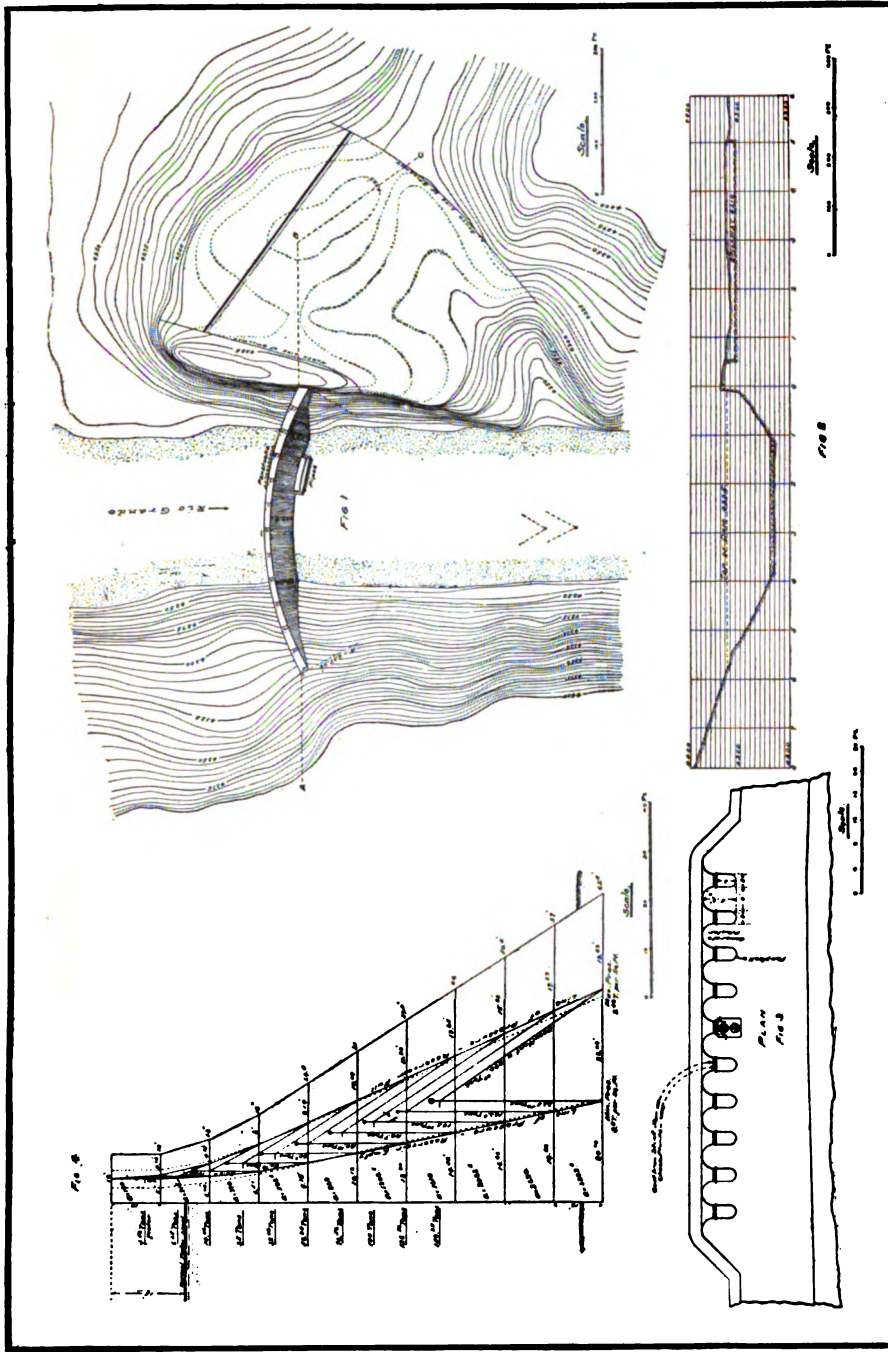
ELEPHANT BUTTE DAM ON RIO GRANDE, ABOVE EL PASO, TEXAS. PLAN AND SECTION OF DAM-SITE, PROFILE OF DAM, AND PLAN OF OUTLETS.
